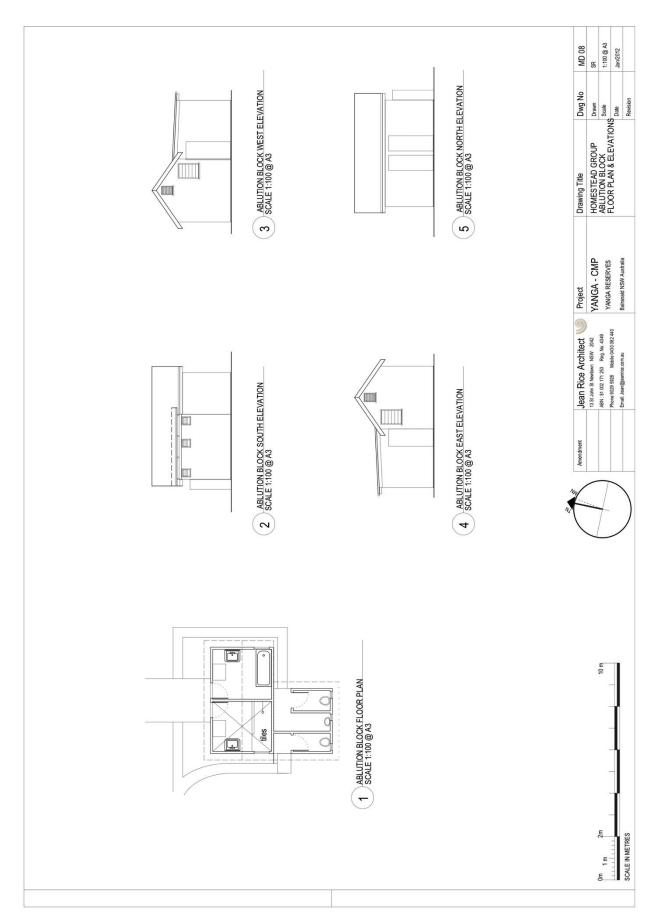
Homestead Group Ablution Block floor plan and elevations. Jean Rice Architect, site assessment 2009.
